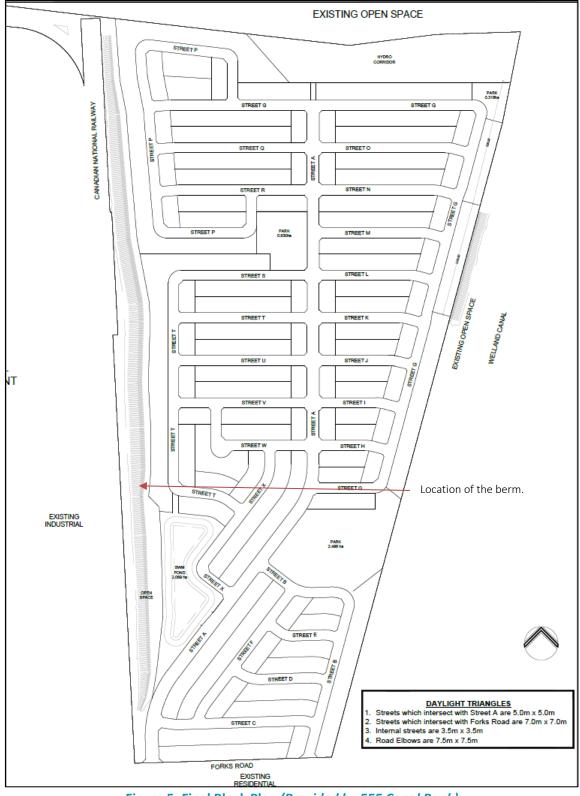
Final Block Plan (Provided by 555 Canal Bank)
